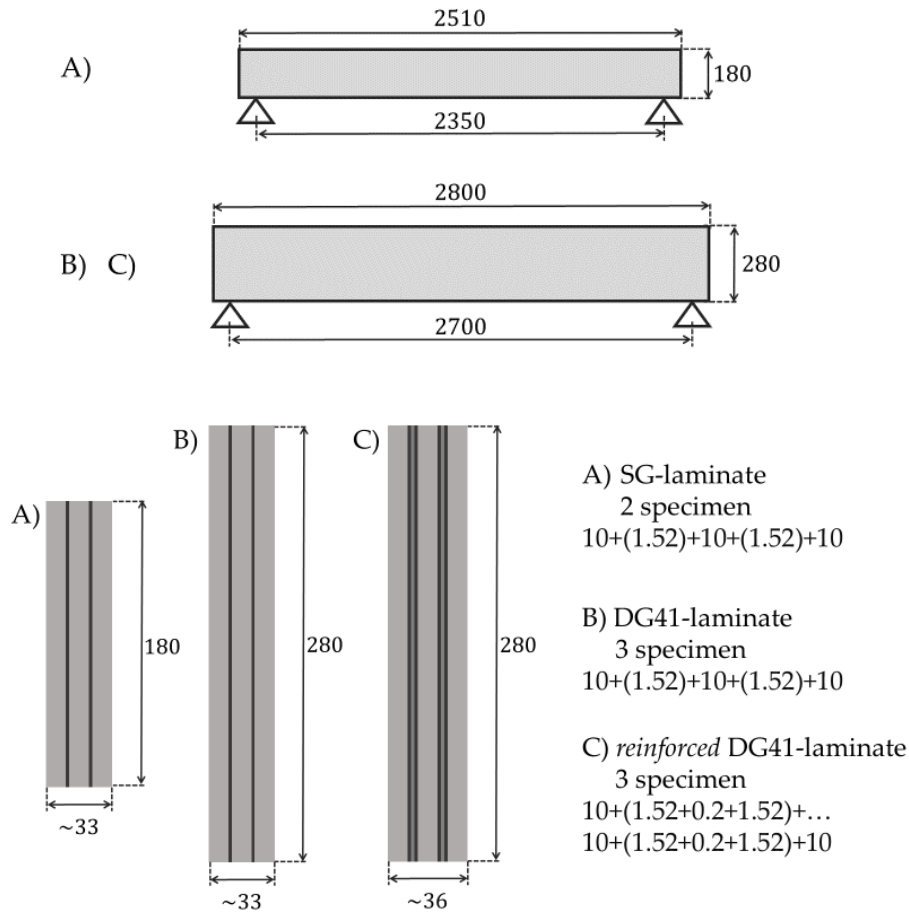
full-scale LG beams specimens type A, B and C [mm]
